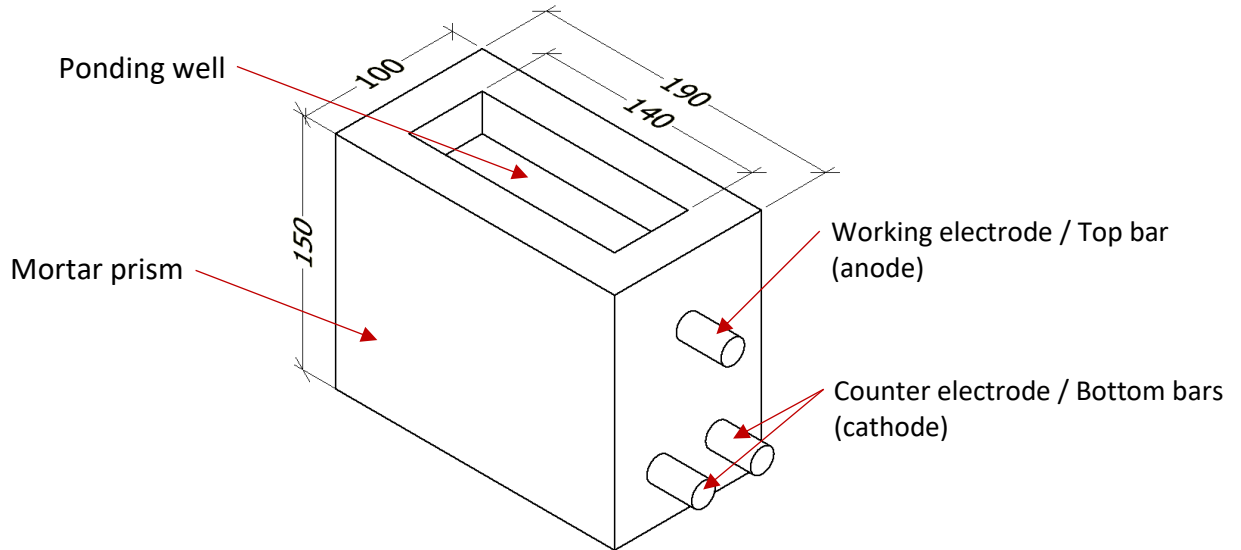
Modified ASTM G955 test specimen (measurements in mm)
